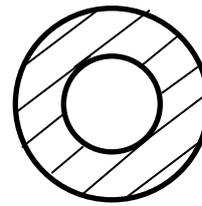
Basic view of Tubular section 150mm diameter and 6 mm thickness
